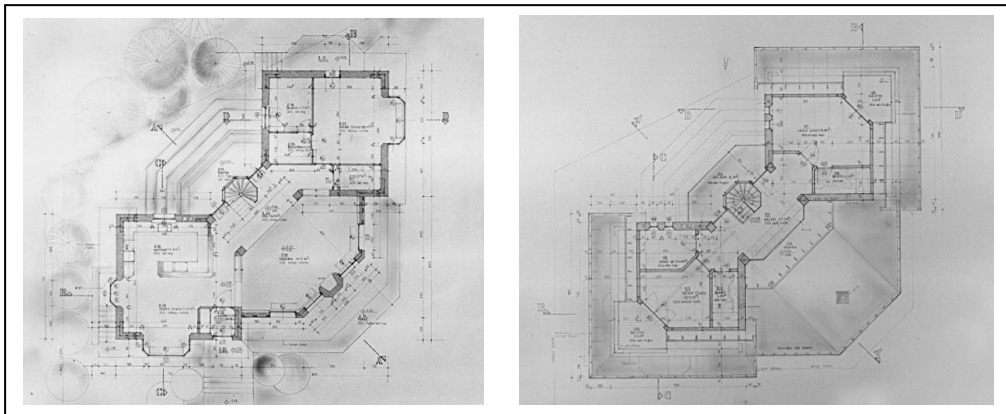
Floor plans of G. Sururi house, 1995 [95]
